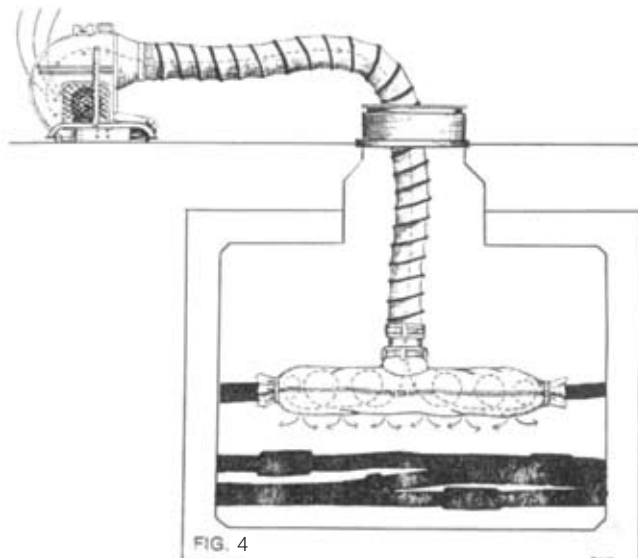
Illustrates a typical Windbag cable-drying operation. Heater/Blower should be placed a minimum of 5 inches from manhole opening.
